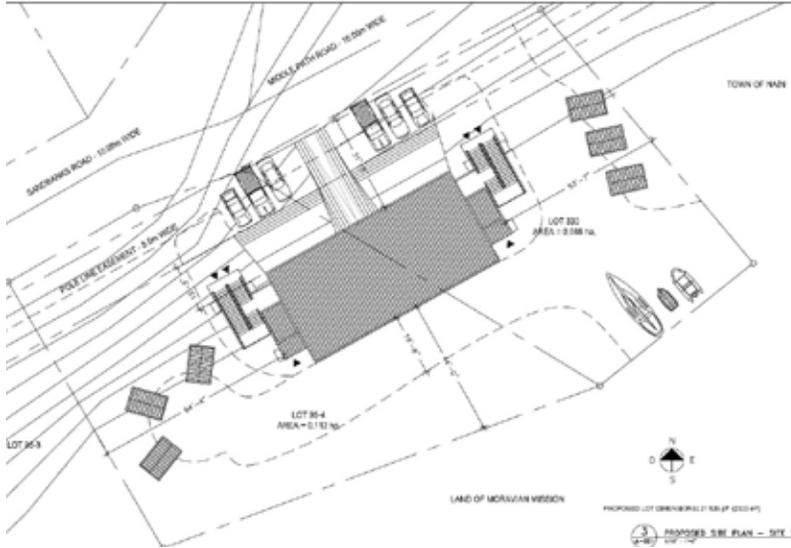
Site Plan with storage units and boat parking area (Design: EVOQ Architects and W Semple)
